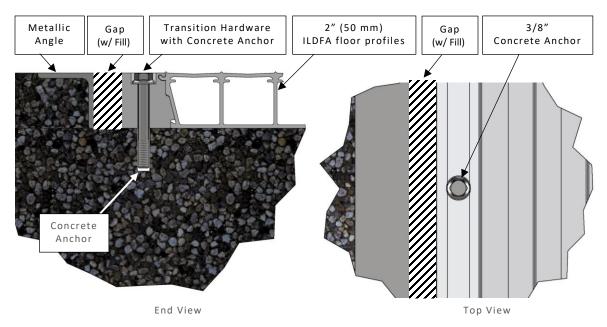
Transition from Hangar Slab to ILDFA with Recessed Concrete
